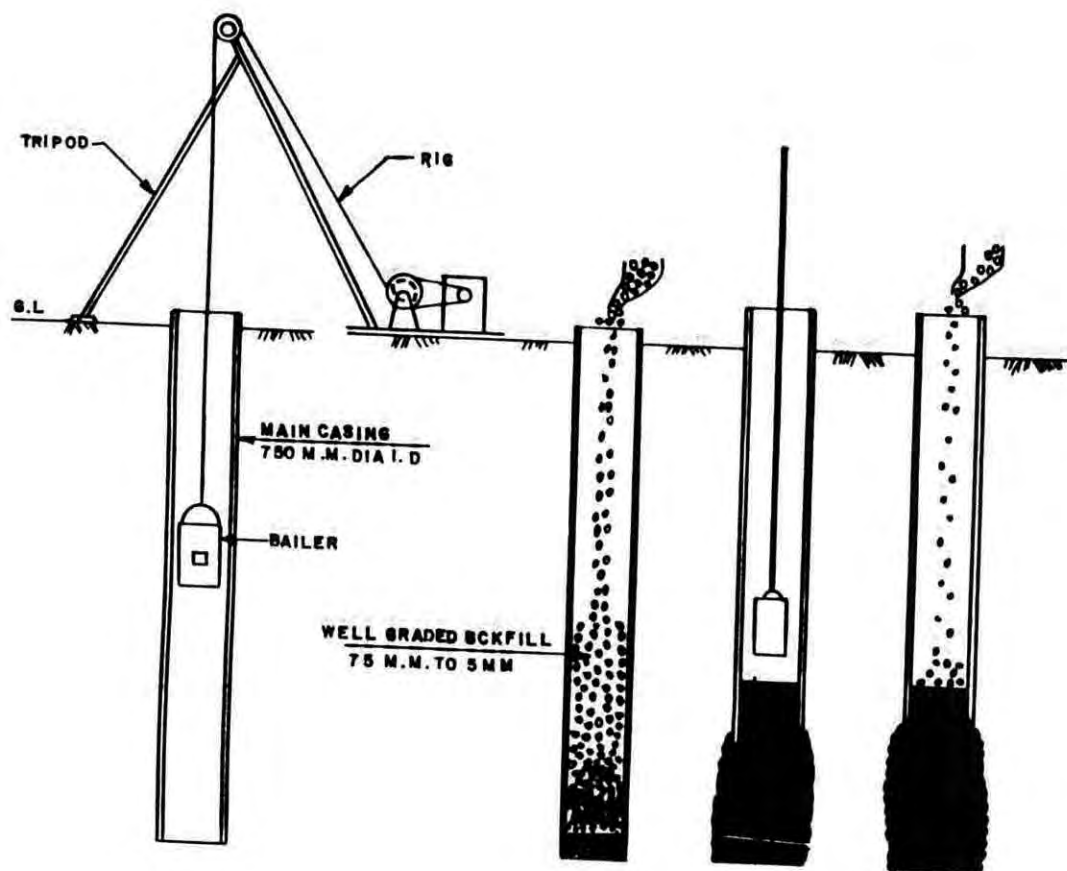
Stages of construction of stone column by bored piling equipment.
